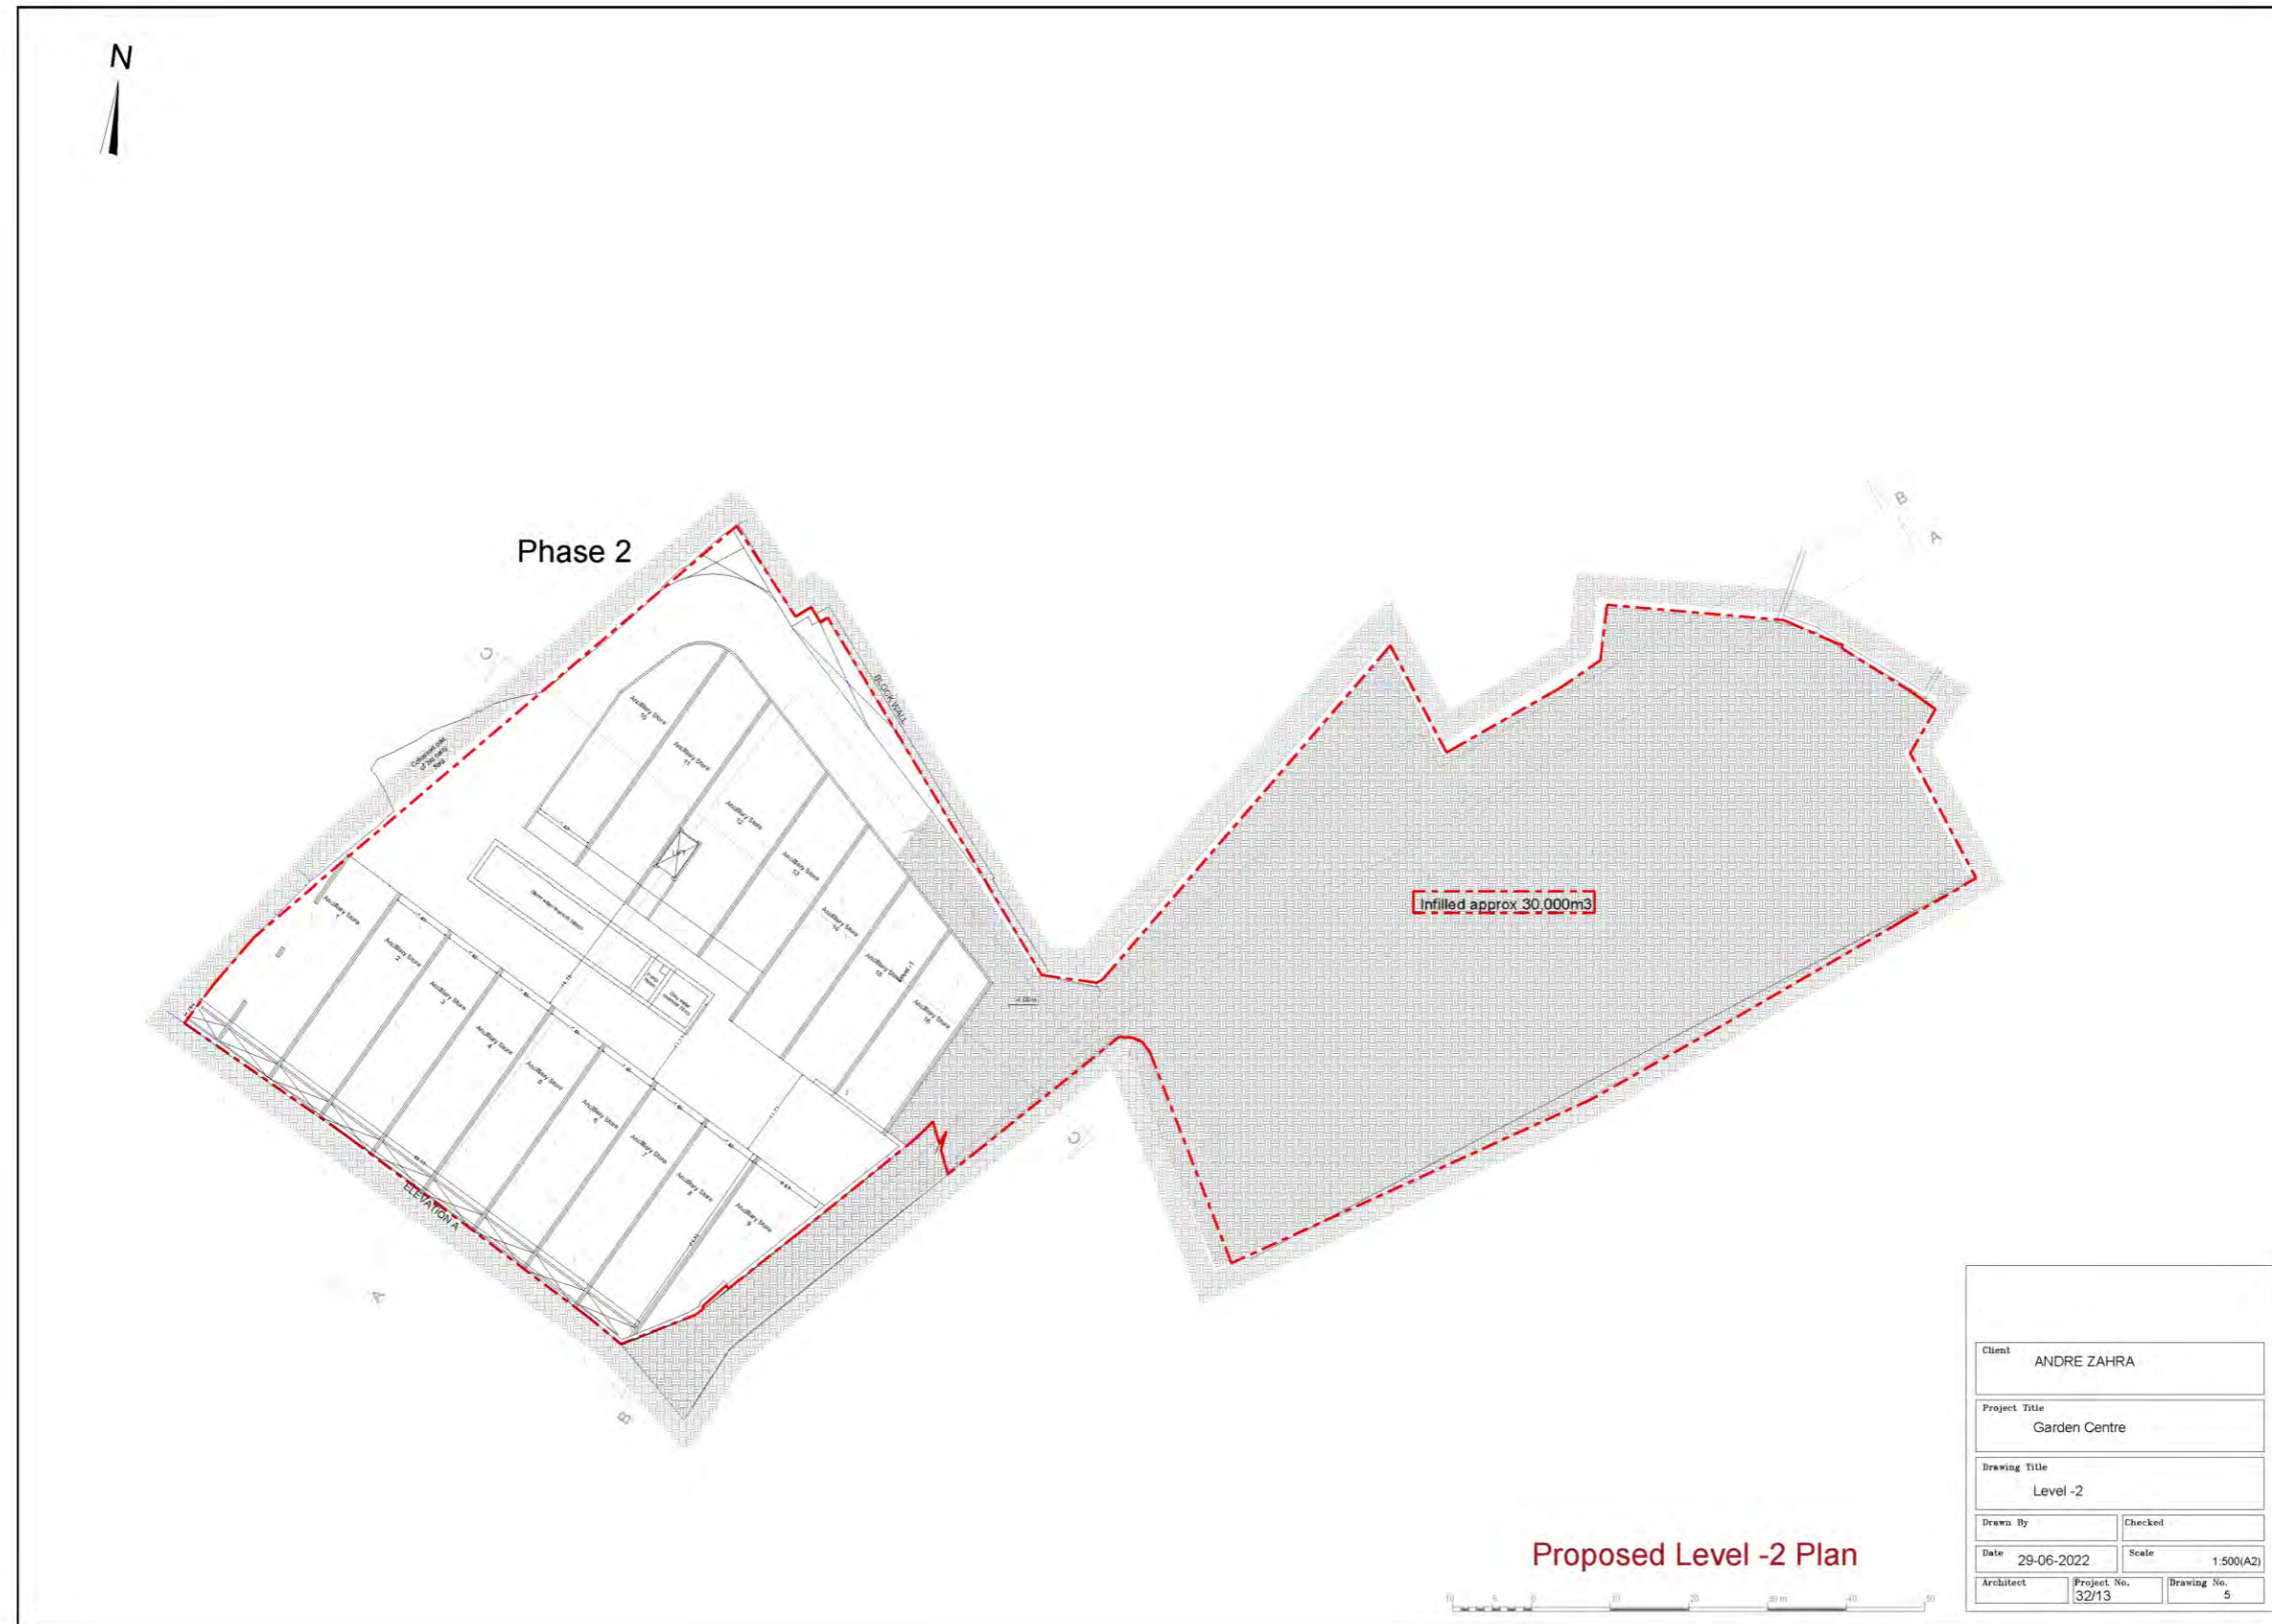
PROPOSED PLAN FOR LEVEL -2
